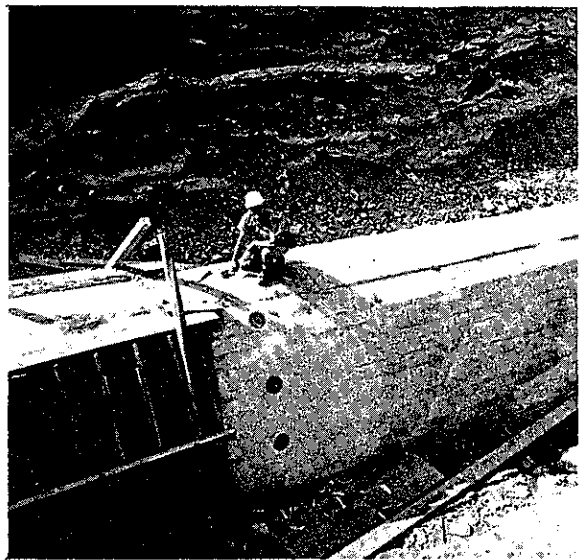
Openings for stress meters at Station No. 2 after removal of wooden blanks.
